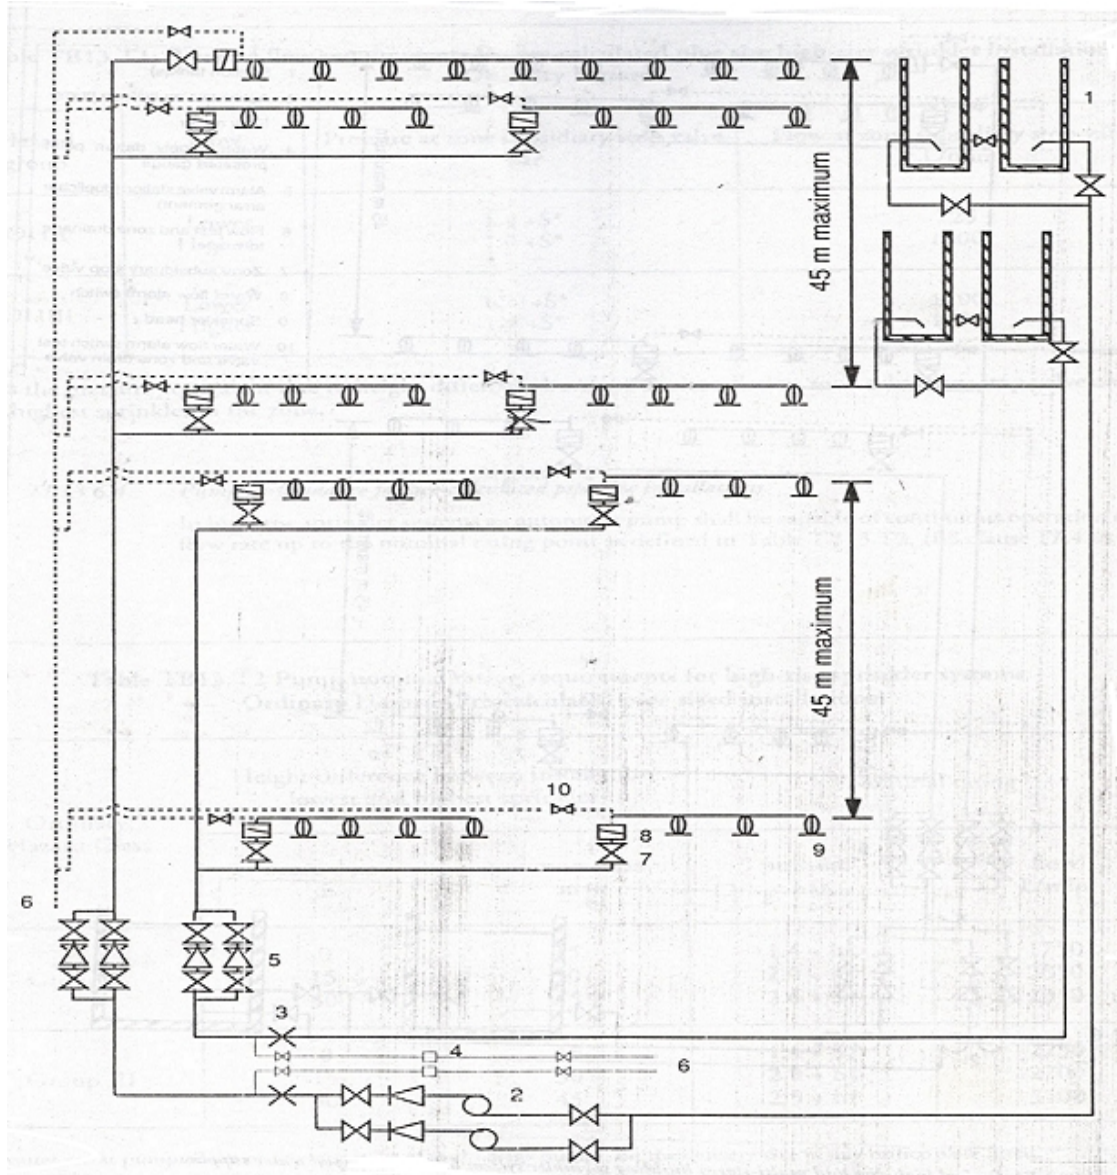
Typical High-Rise and Multi-Story Building Sprinkler Layout, (BS 5306:Part4, 2006).
